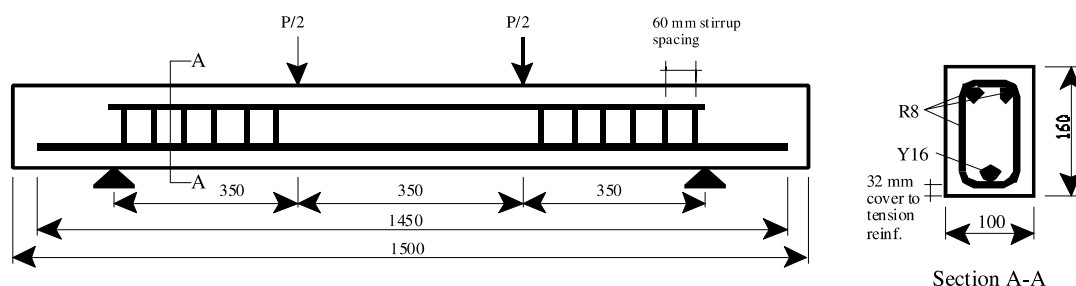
Dimensions and reinforcement details of the concrete beams tested.
